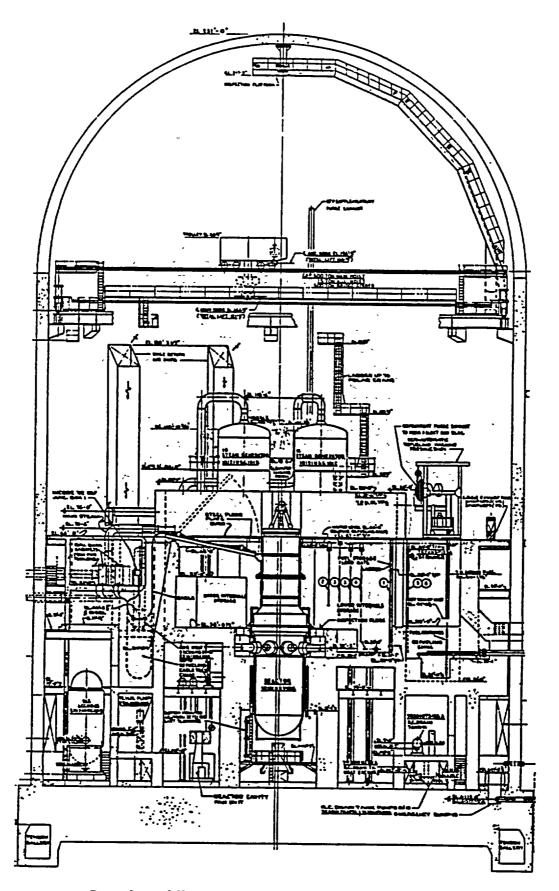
Section View of South Texas Large, Dry Containment (3-D Post-Tensioned Concrete)
